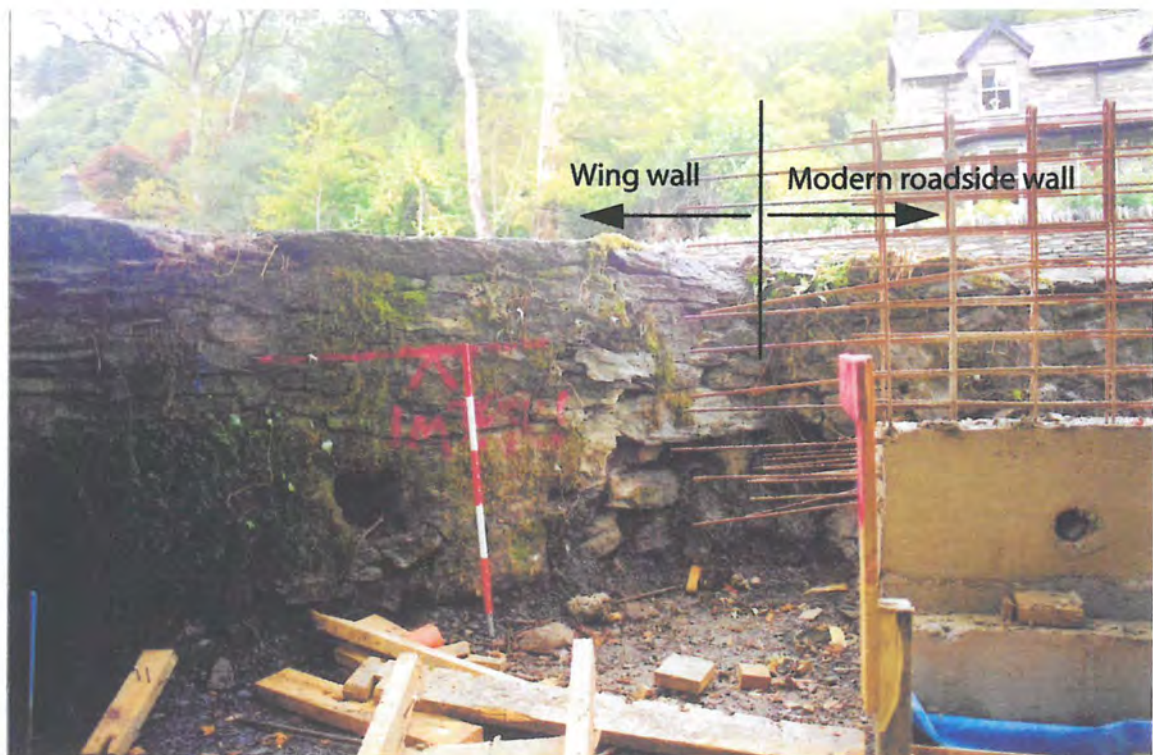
Pont-ar-Lledr wing wall, eastern face and adjacent roadside wall
